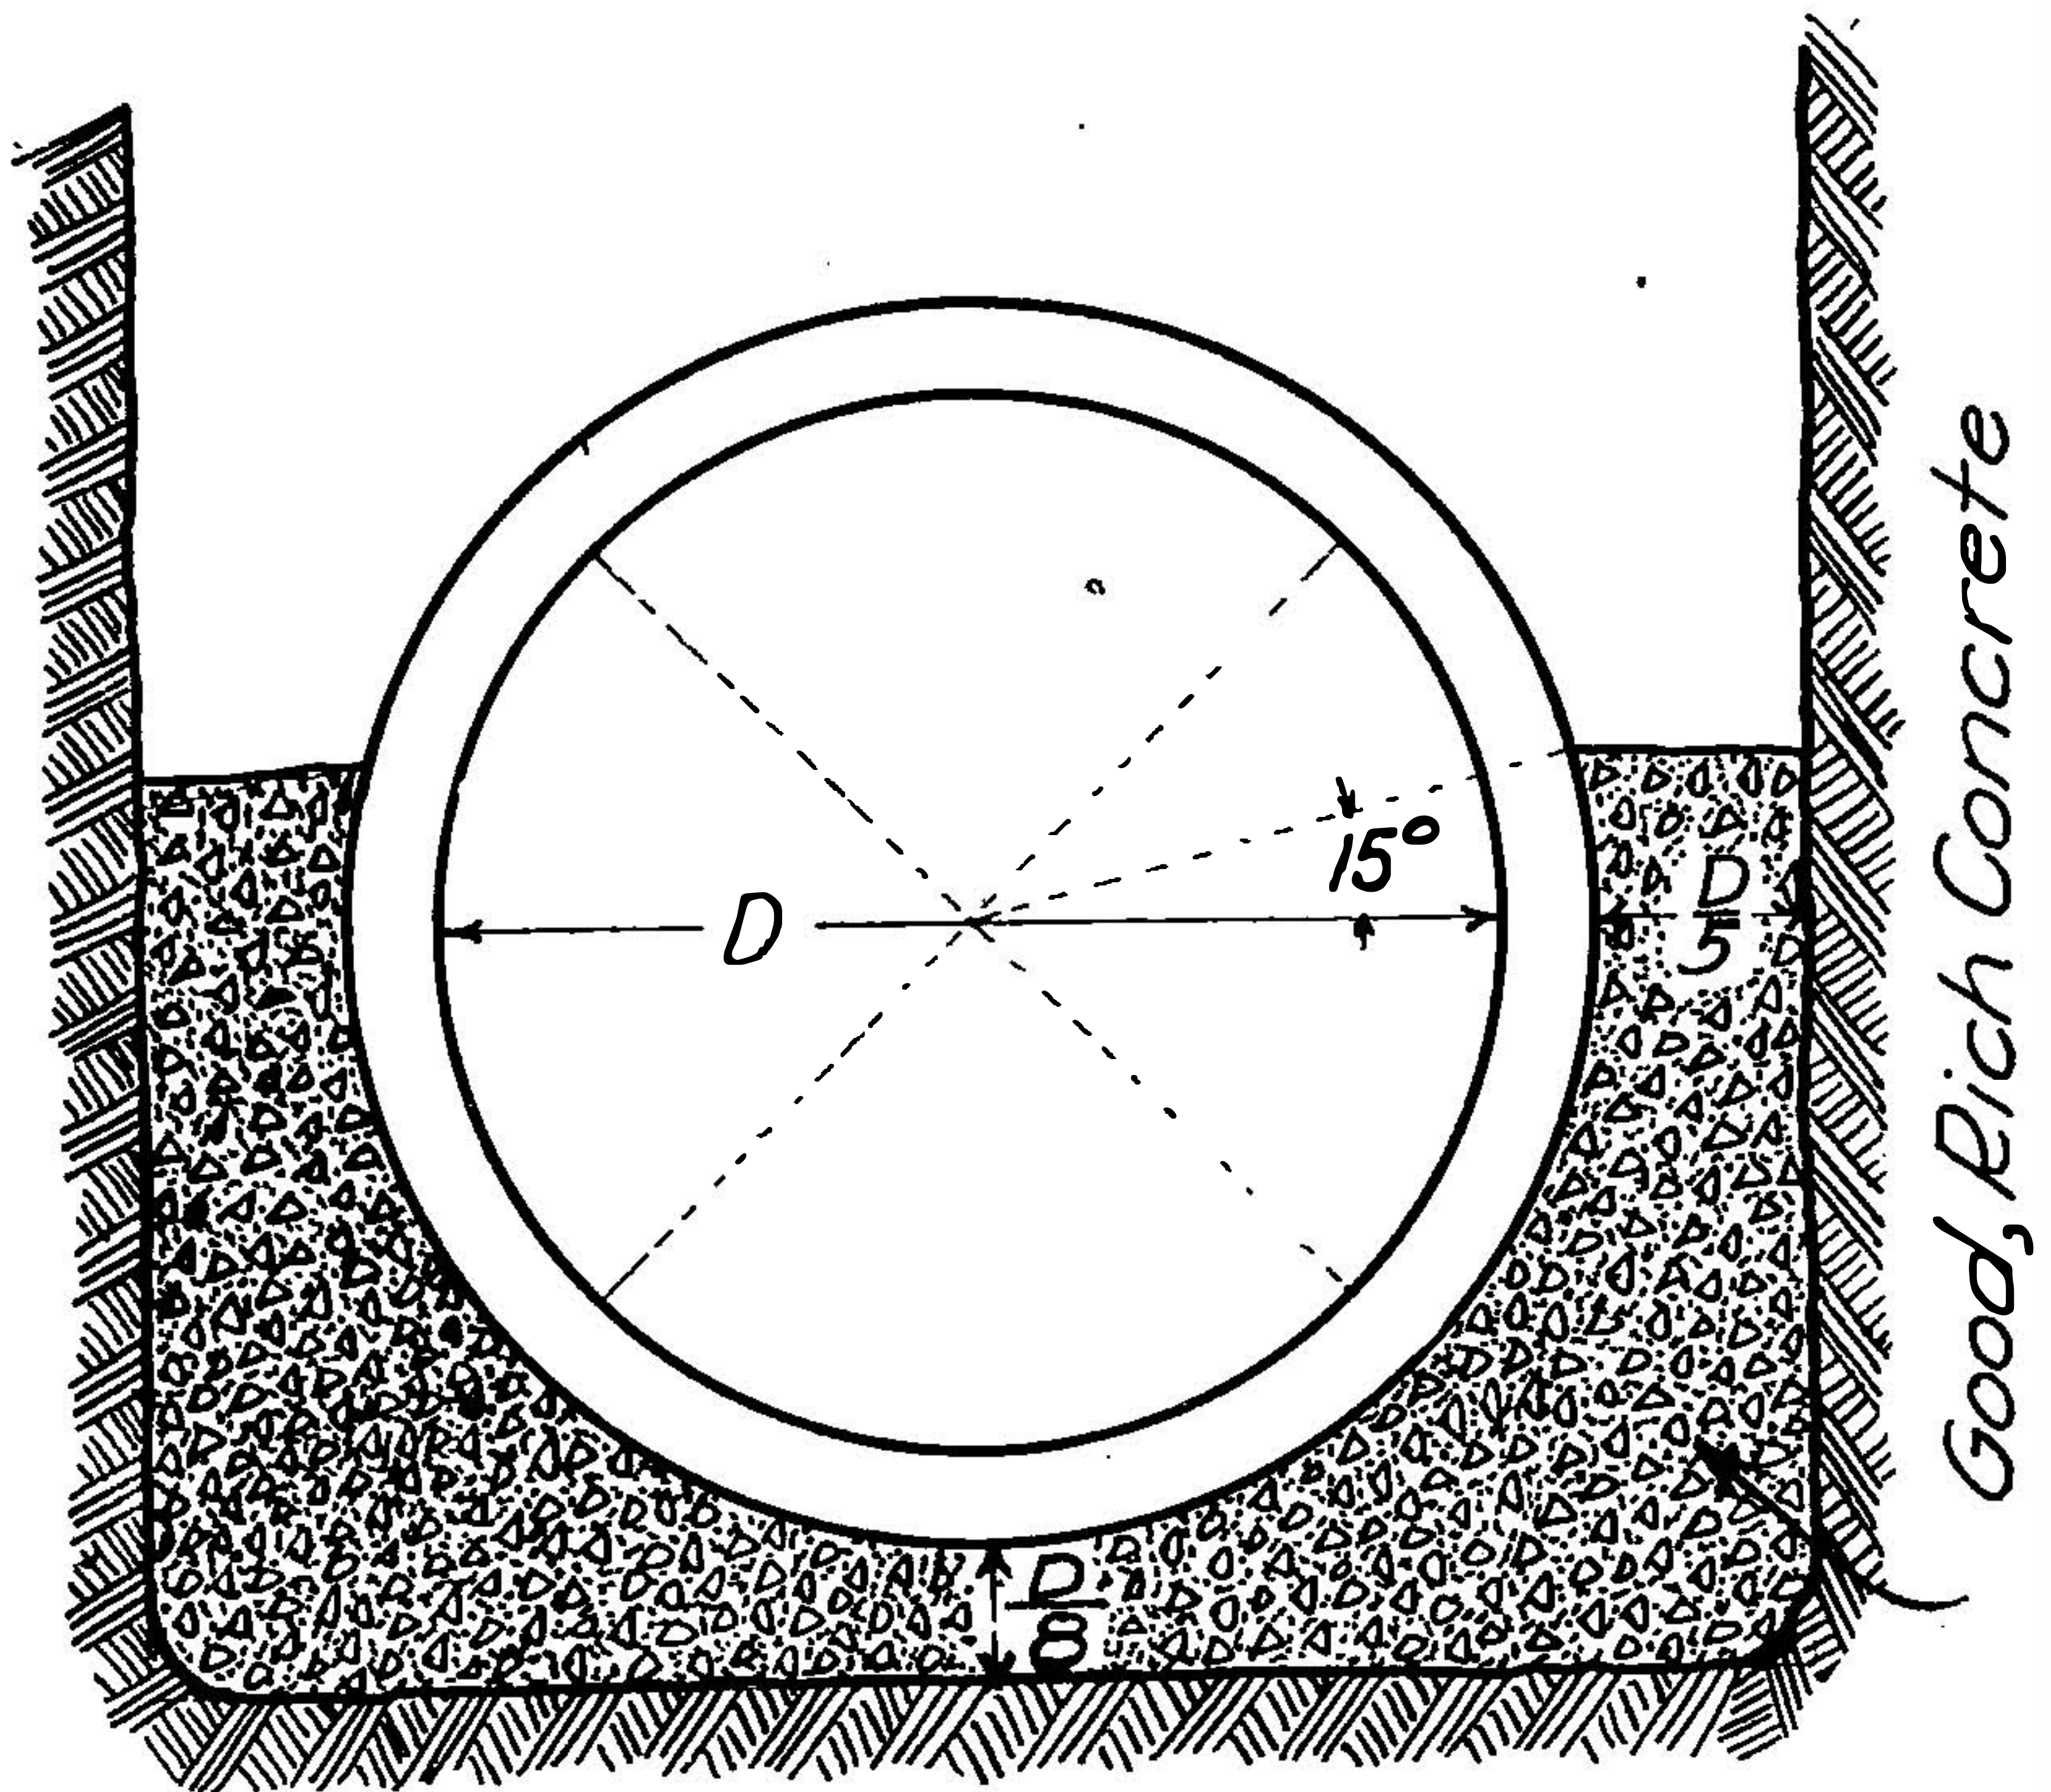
Method of Strengthening Drain Tile and Sewer Pipe to Carry Heavy Loads, by Bedding in Concrete, in Yielding Soils.
